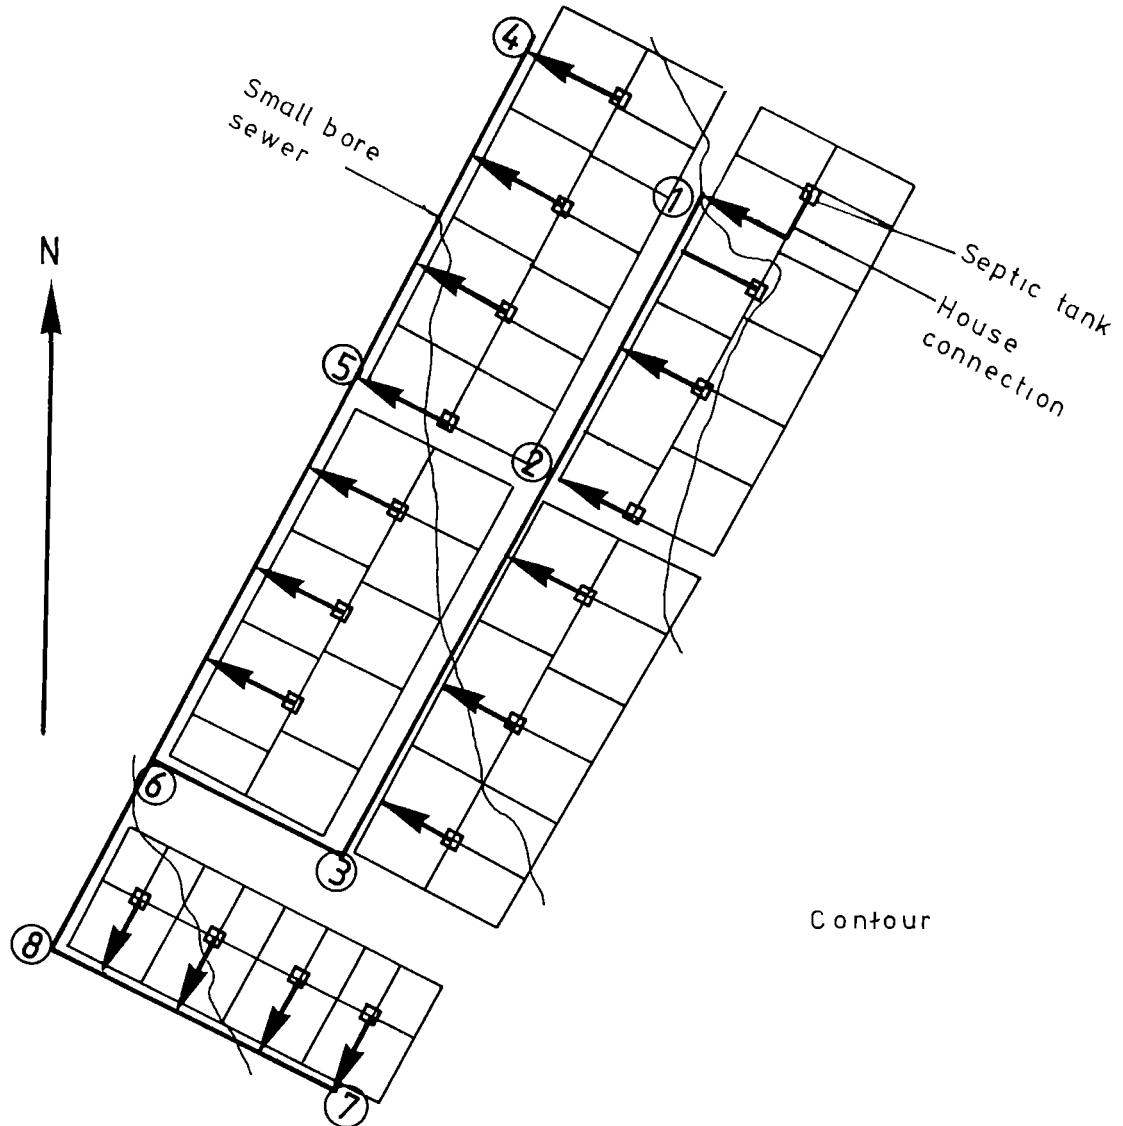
Site plan showing the arrangement of houses, septic tanks and proposed sewer line (Addis Ababa Masterplan Office 1986).
